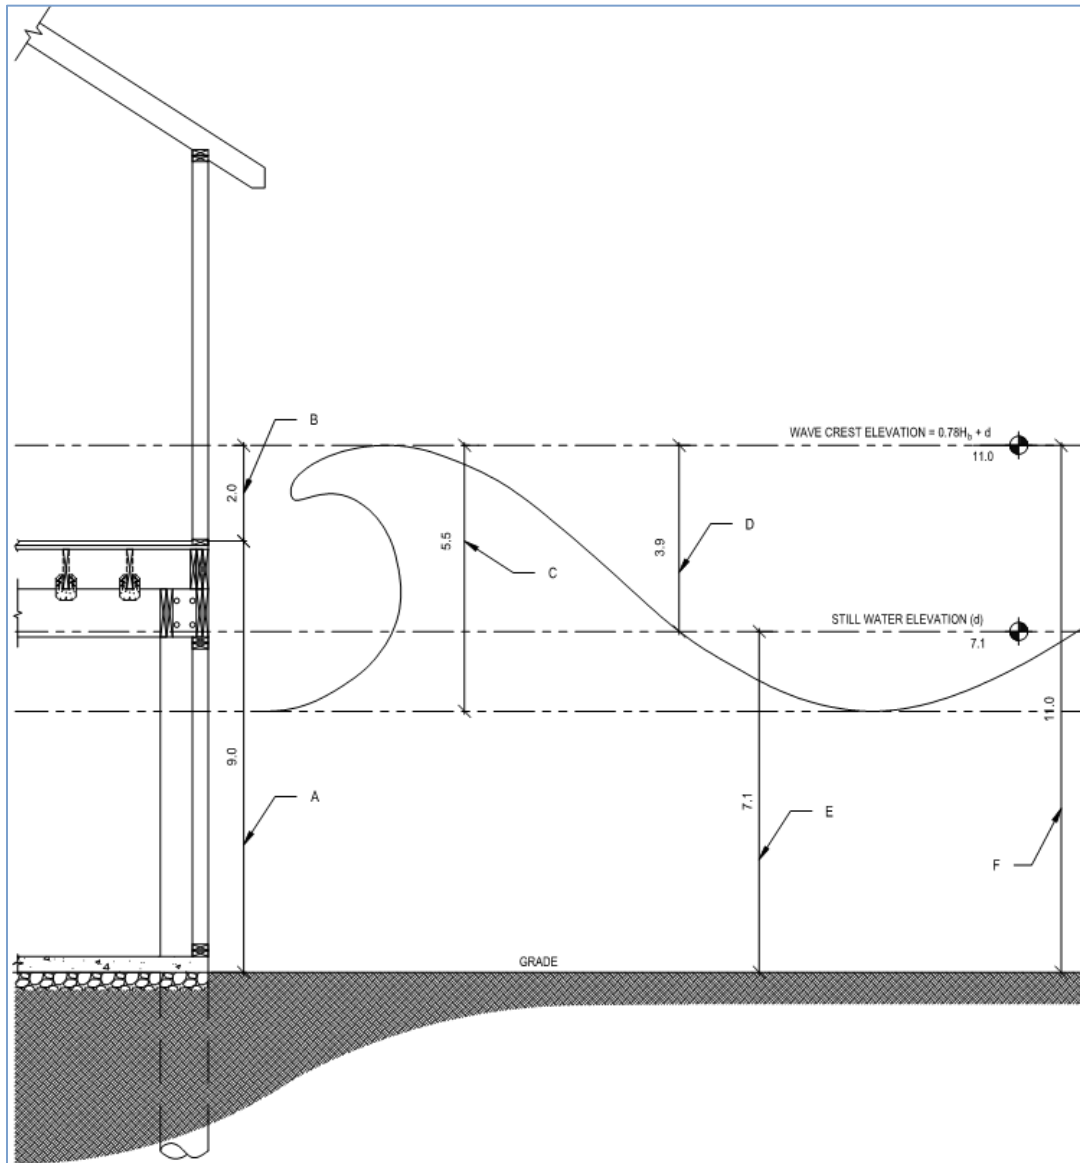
Illustration of Maximum Wave Damage Scenario, Prototype 7B Building on Pile Foundation with Enclosures, Most Likely Building Characteristics
